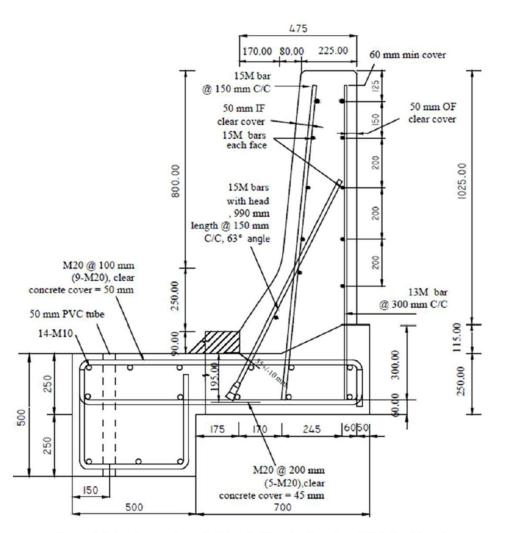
Barrier specimen B-4 details (Exterior Location - With Cantilever)
